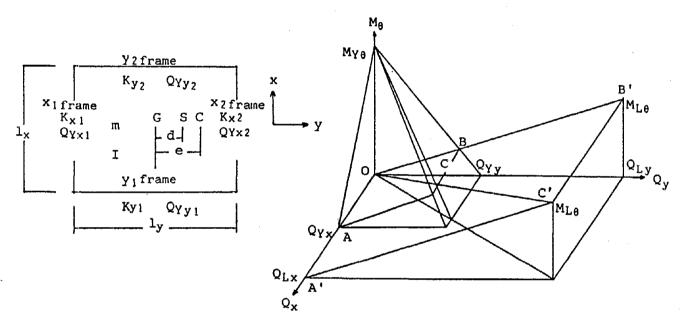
Floor plan with Fig. 15 Damage prediction eccentricity surface
